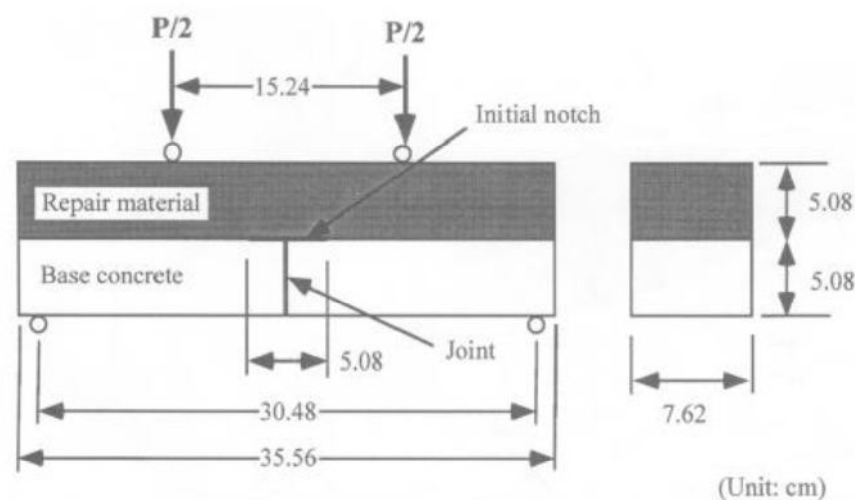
Dimension of specimen and loading configuration for a crack trapping mechanism test (LIM & LI, 1997)
